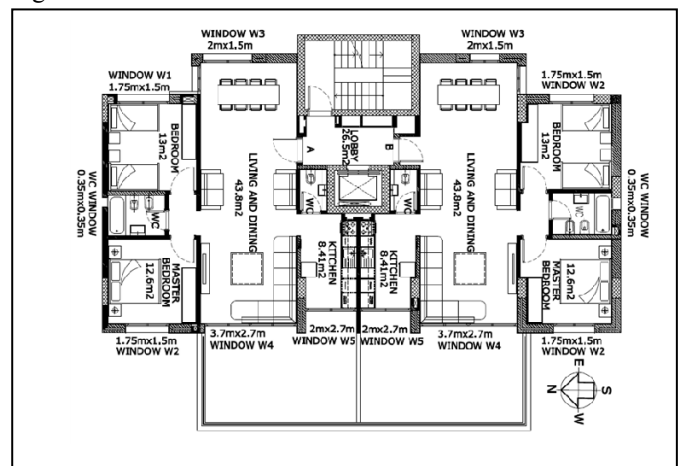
FIGURE I PLAN VIEW OF BUILDING'S TYPICAL FLOORS (WITH TWO APARTMENTS A AND B)
